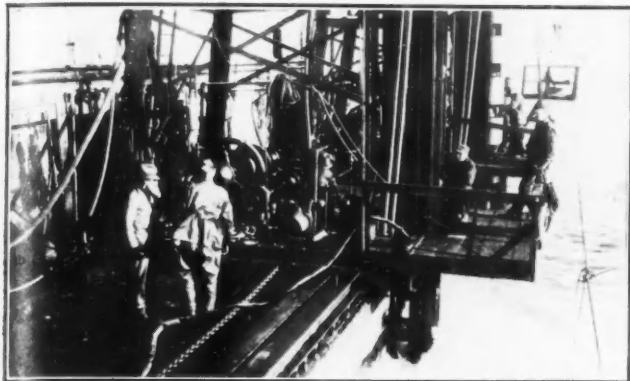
View of Drill Derricks, Working Platforms and Track.
